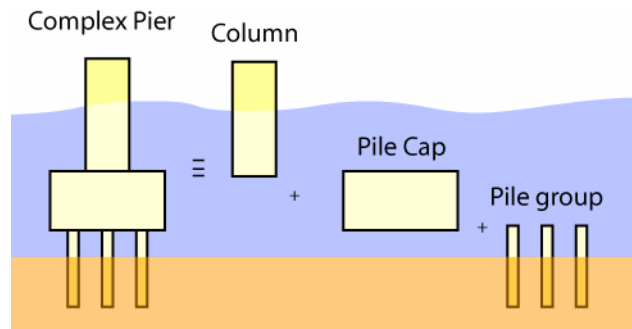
Schematic drawing of a complex pier showing the 3 components, column, pile cap and pile group.
